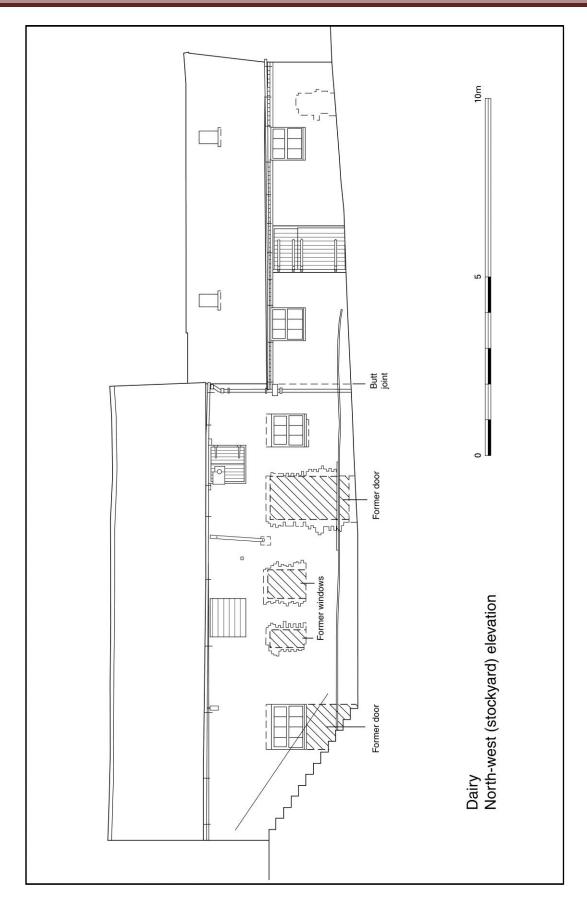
A: Drawing of the north-west (stockyard-facing) elevation of the two-part dairy range.
